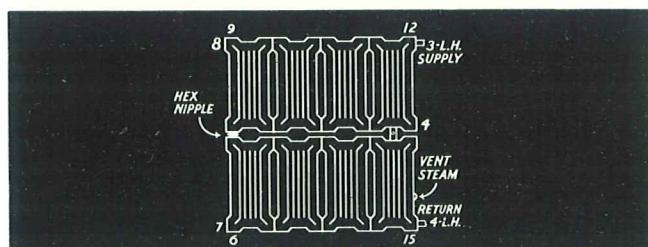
Assembled in eight sections in two tiers. For two pipe steam using adjustable spacing saddle.
